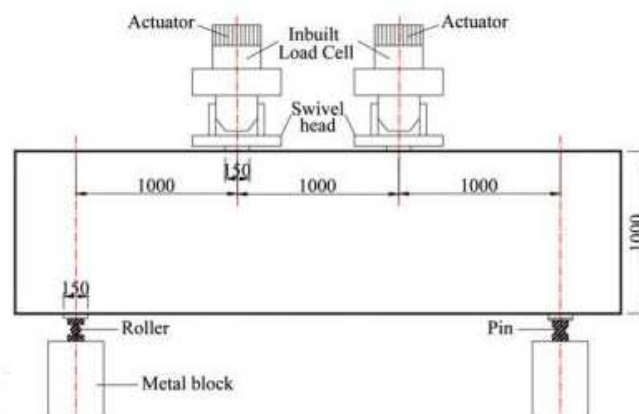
Typical Test Setup for Large RC Deep Beams of (Ning Zhang, 2007) Experiment.
